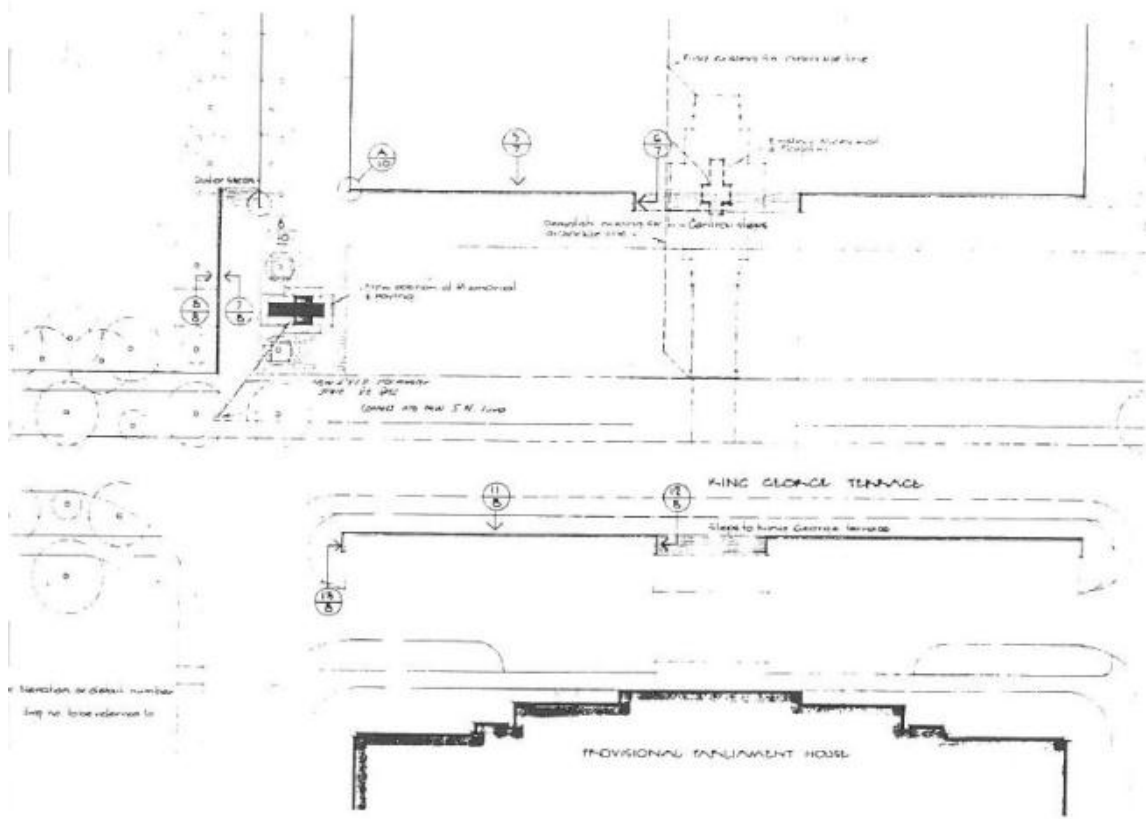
1967 site plan showing proposed new location and new orientation for the King George V Memorial. (Source: Bunning & Madden Architects, Canberra and Sydney)
